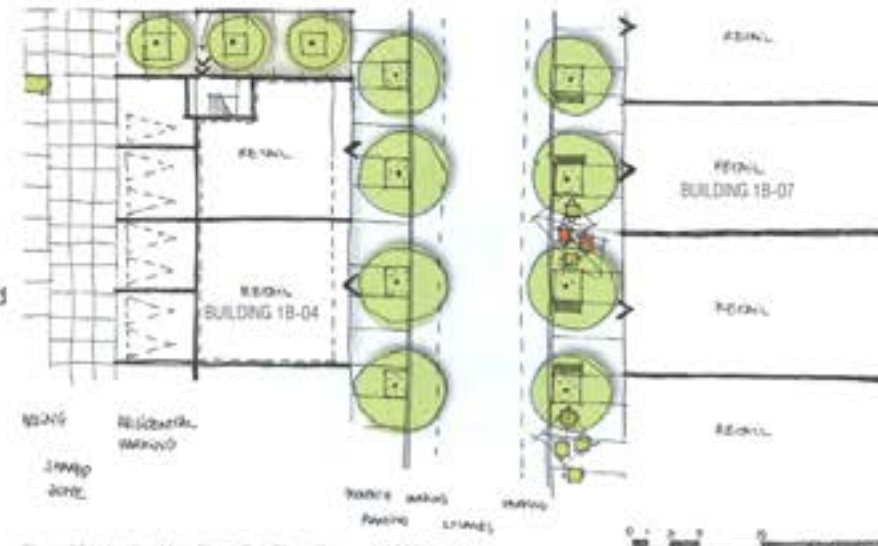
Indicative Main Street Part-Plan (Source: HASSELL, 2008)
